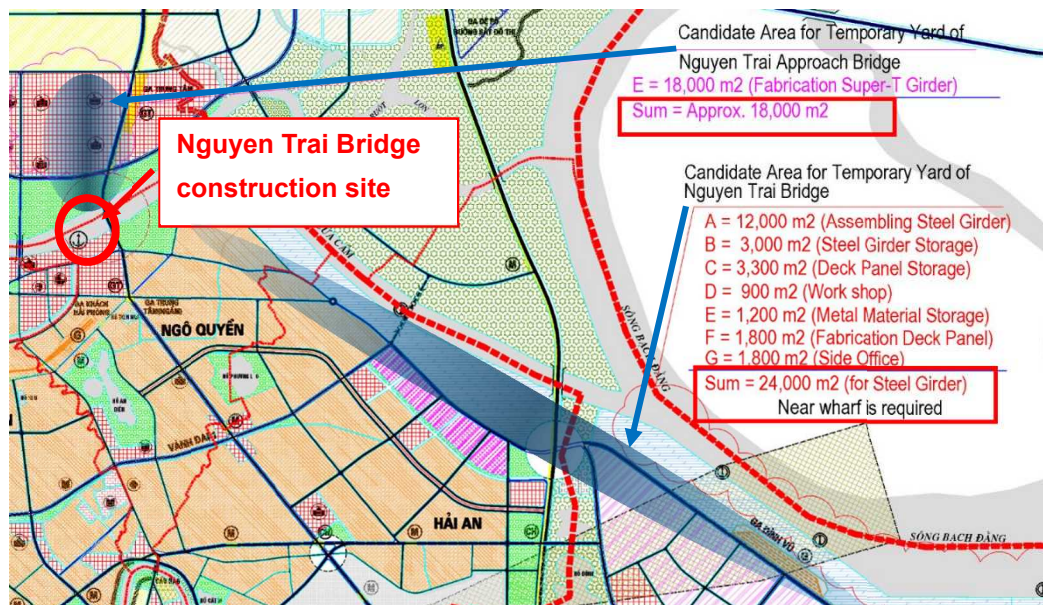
Presumed Location of Temporary Construction Yard
